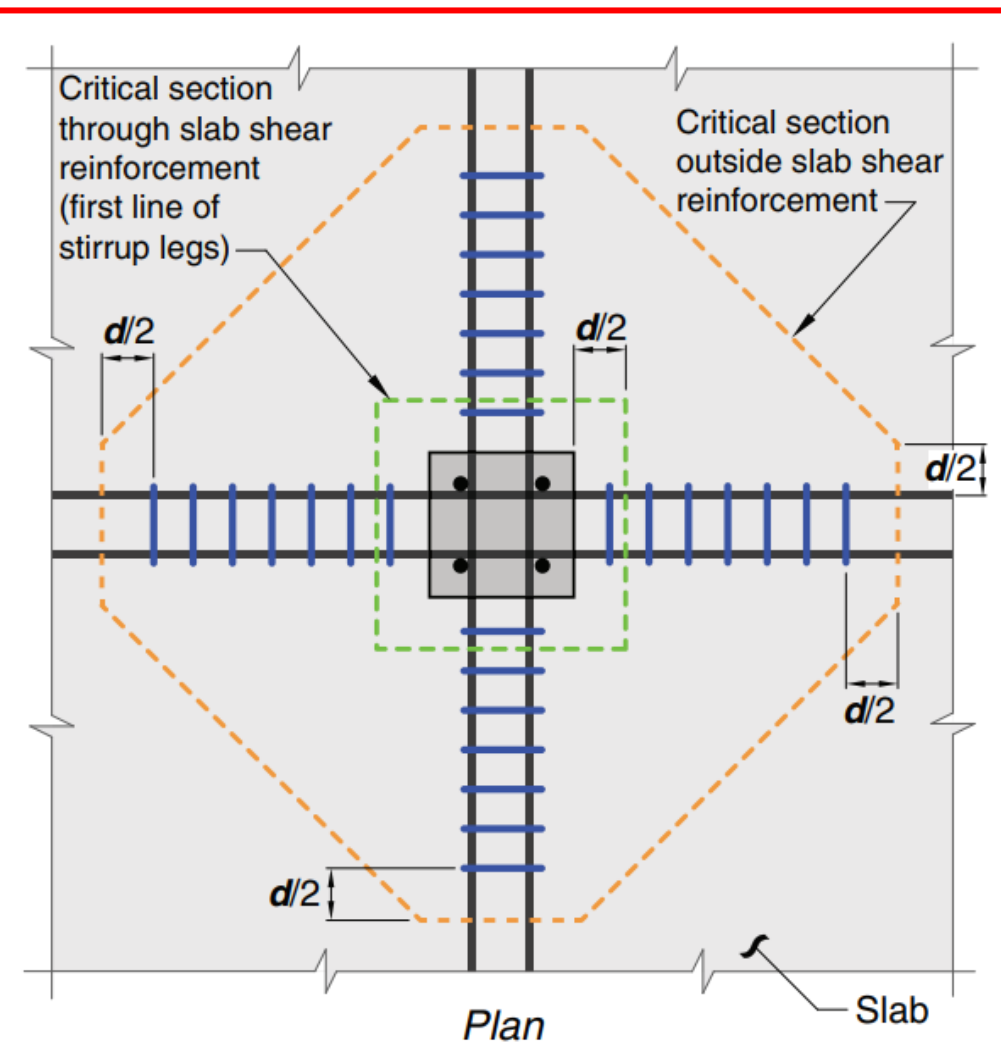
Critical sections for two-way shear in slab with shear reinforcement at interior column.
